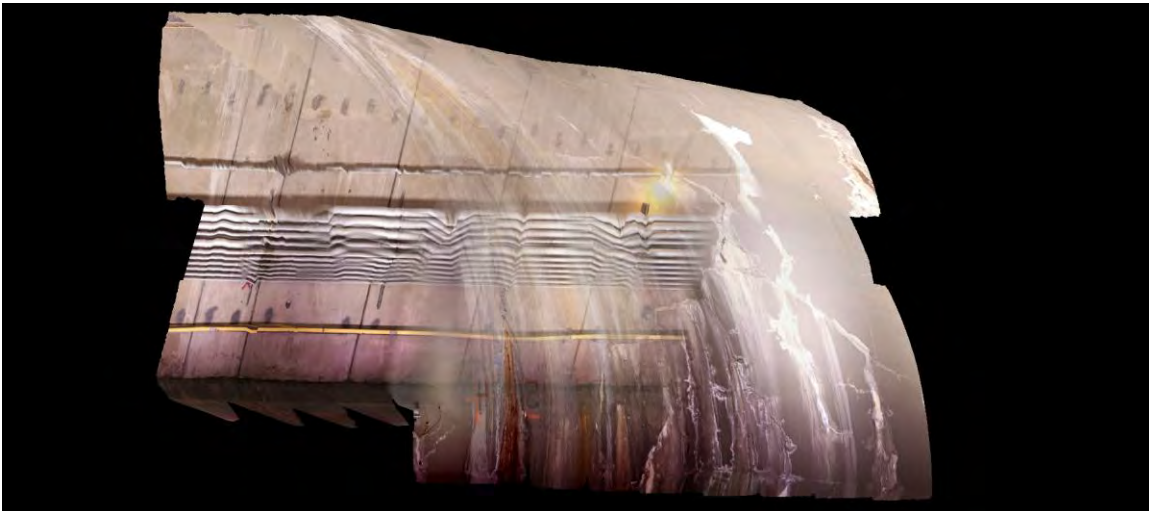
Eisenhower-Johnson Tunnel: clean air supply duct south-west ventilation building.
